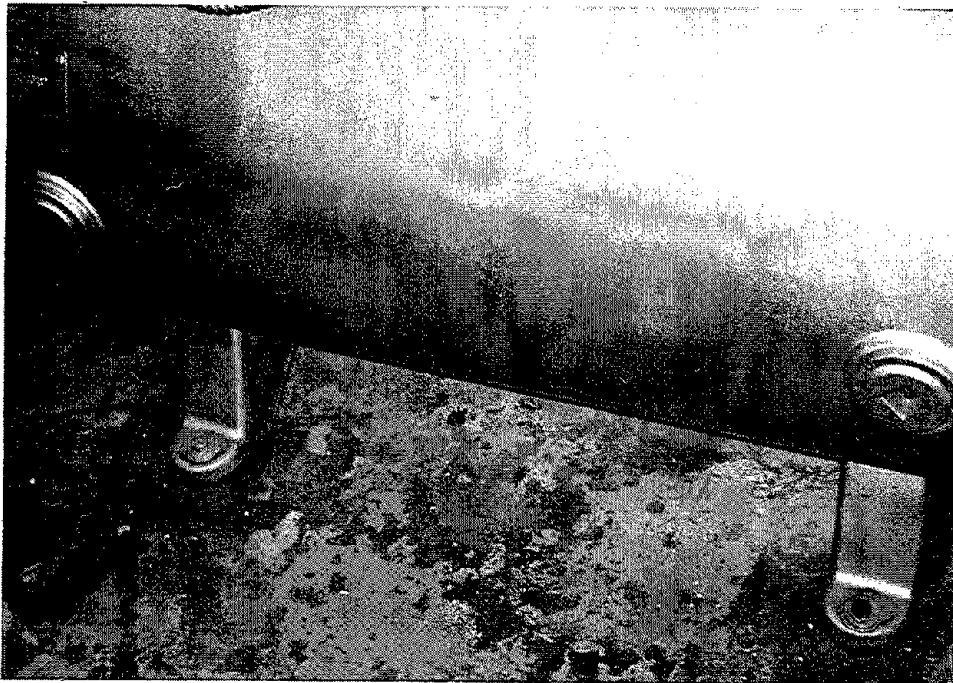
VA Hospital. Air compressor tank bolted solidly to floor.
